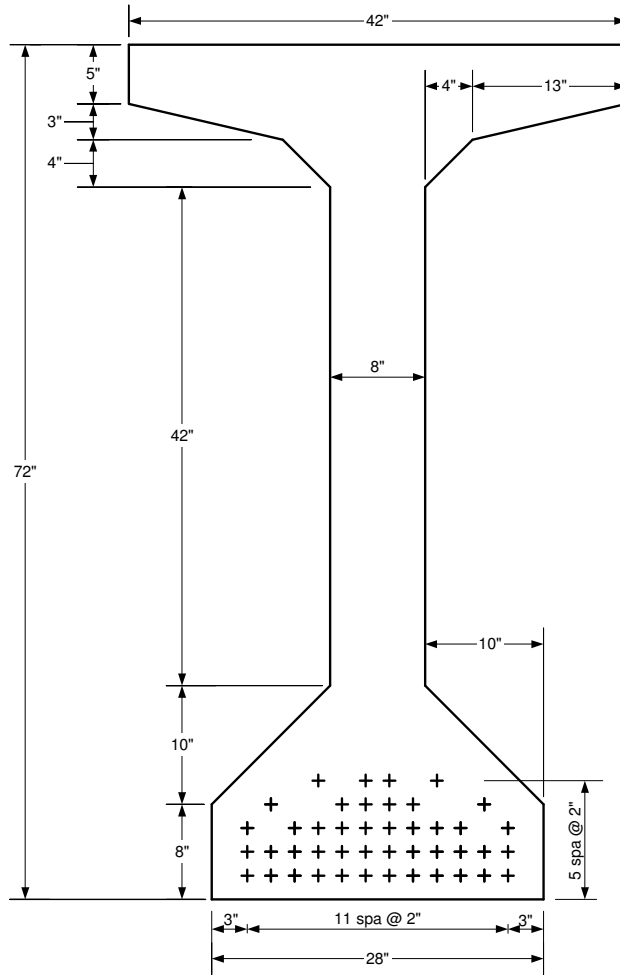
Beam Cross-Section Showing 44 Strands
